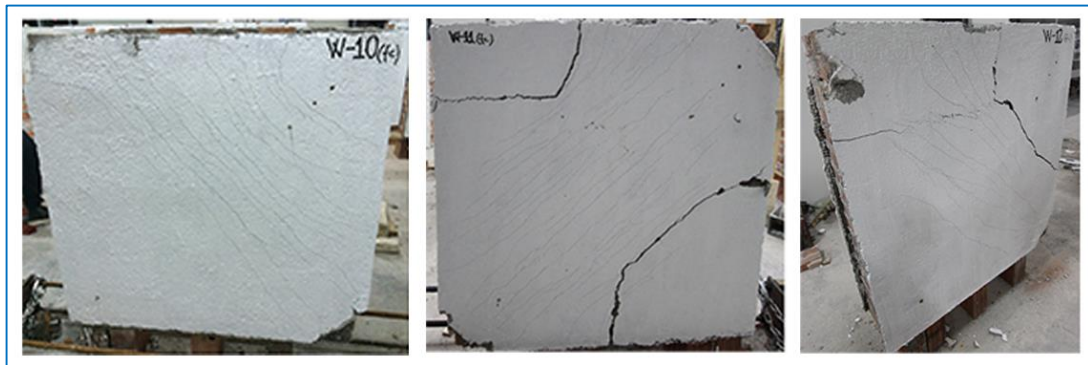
Failure mode of Ferrocement jacketing strengthened wall panels of Series 1.
